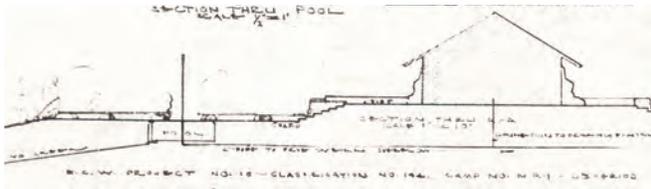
Portion of “Spring Development. Bromide Pavilion Springs,” NP-PLA-3048B, 1935. Cross-section showing relationship of semi-circular bench to the terrace wall and pavilion, to be duplicated in reconstruction.
